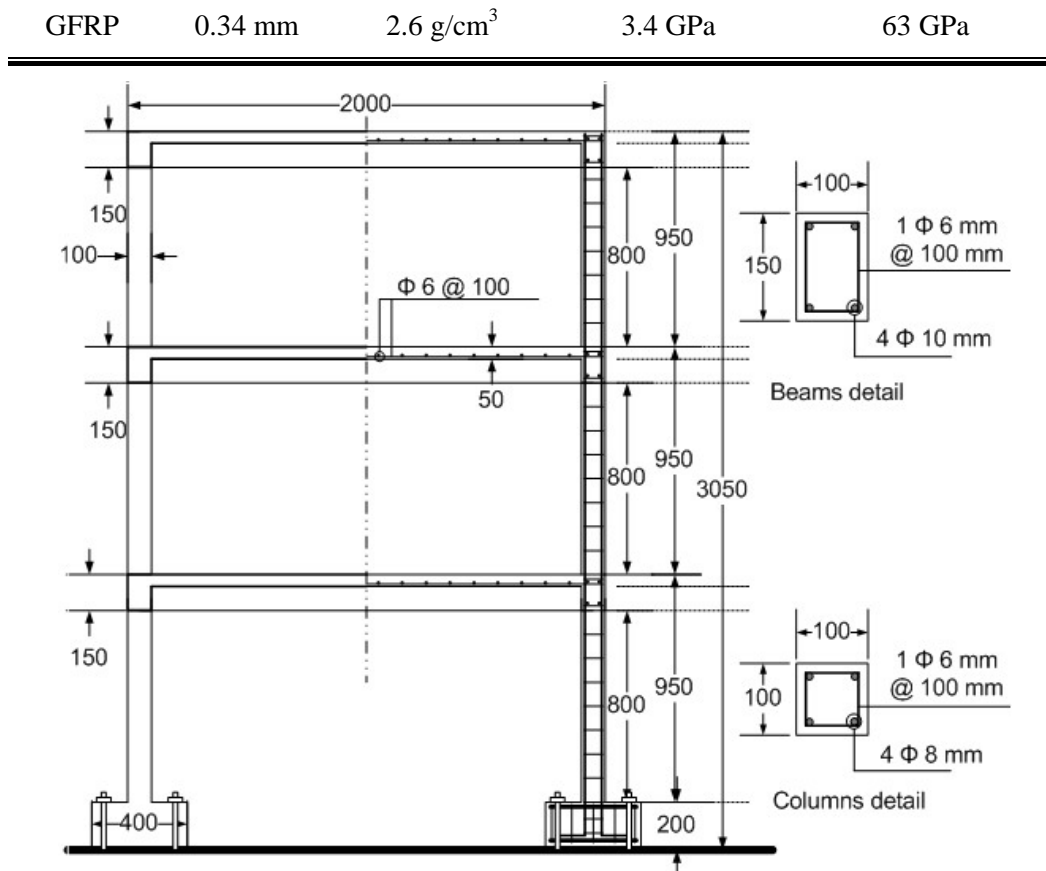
Schematic drawing of the model structure. All dimensions in millimeters
